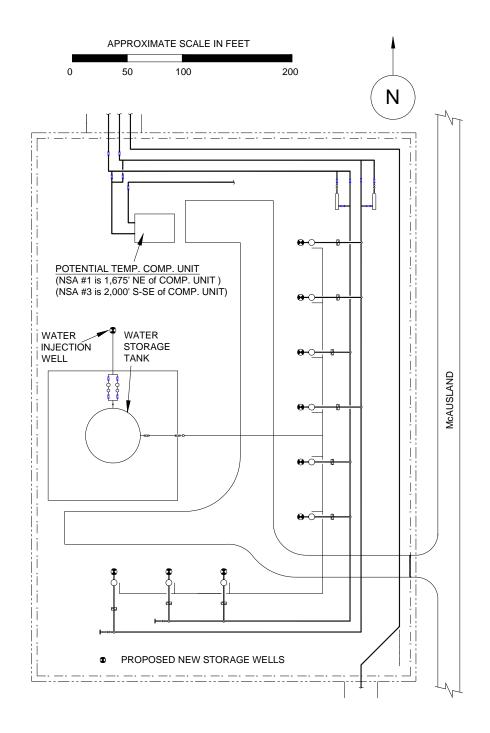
Proposed Central Valley Gas Storage Well Pad Site Plot Plan
